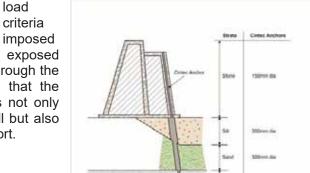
St. Aubin's Fort inner wall ties and mini piles
